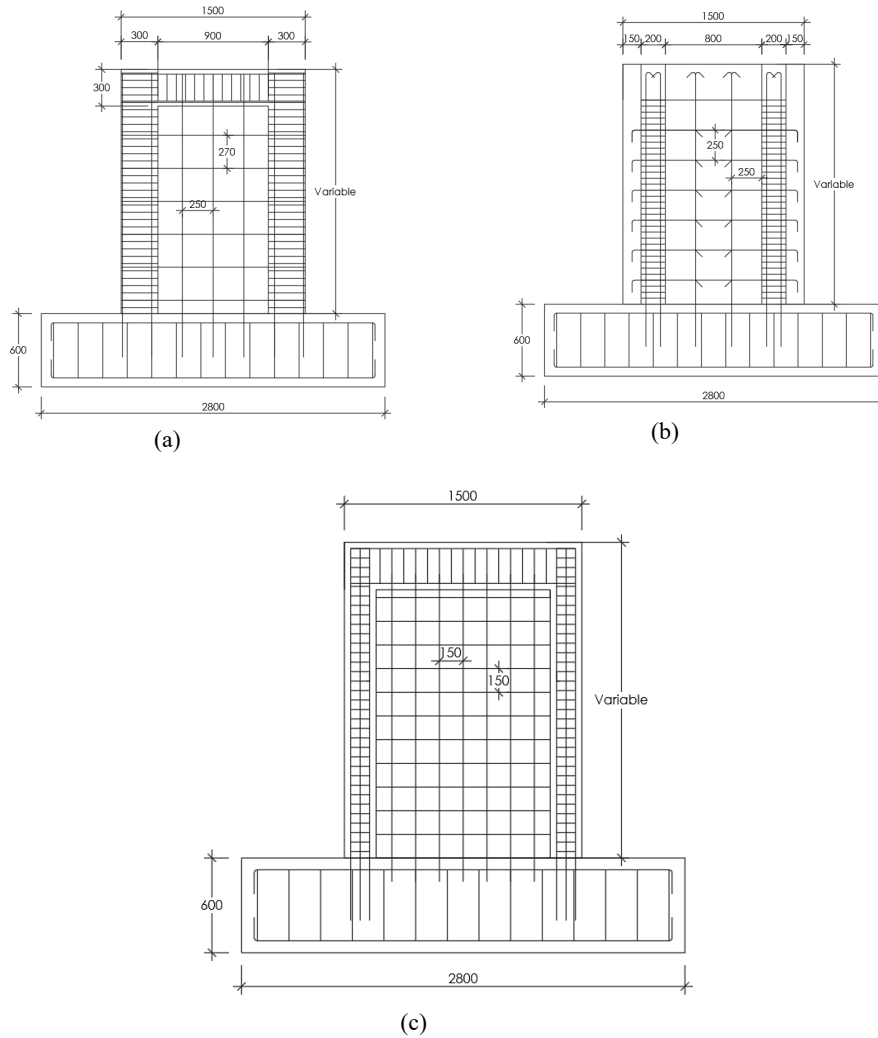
Elevation view details: (a) SW1, (b) SW2, (c) SW3
